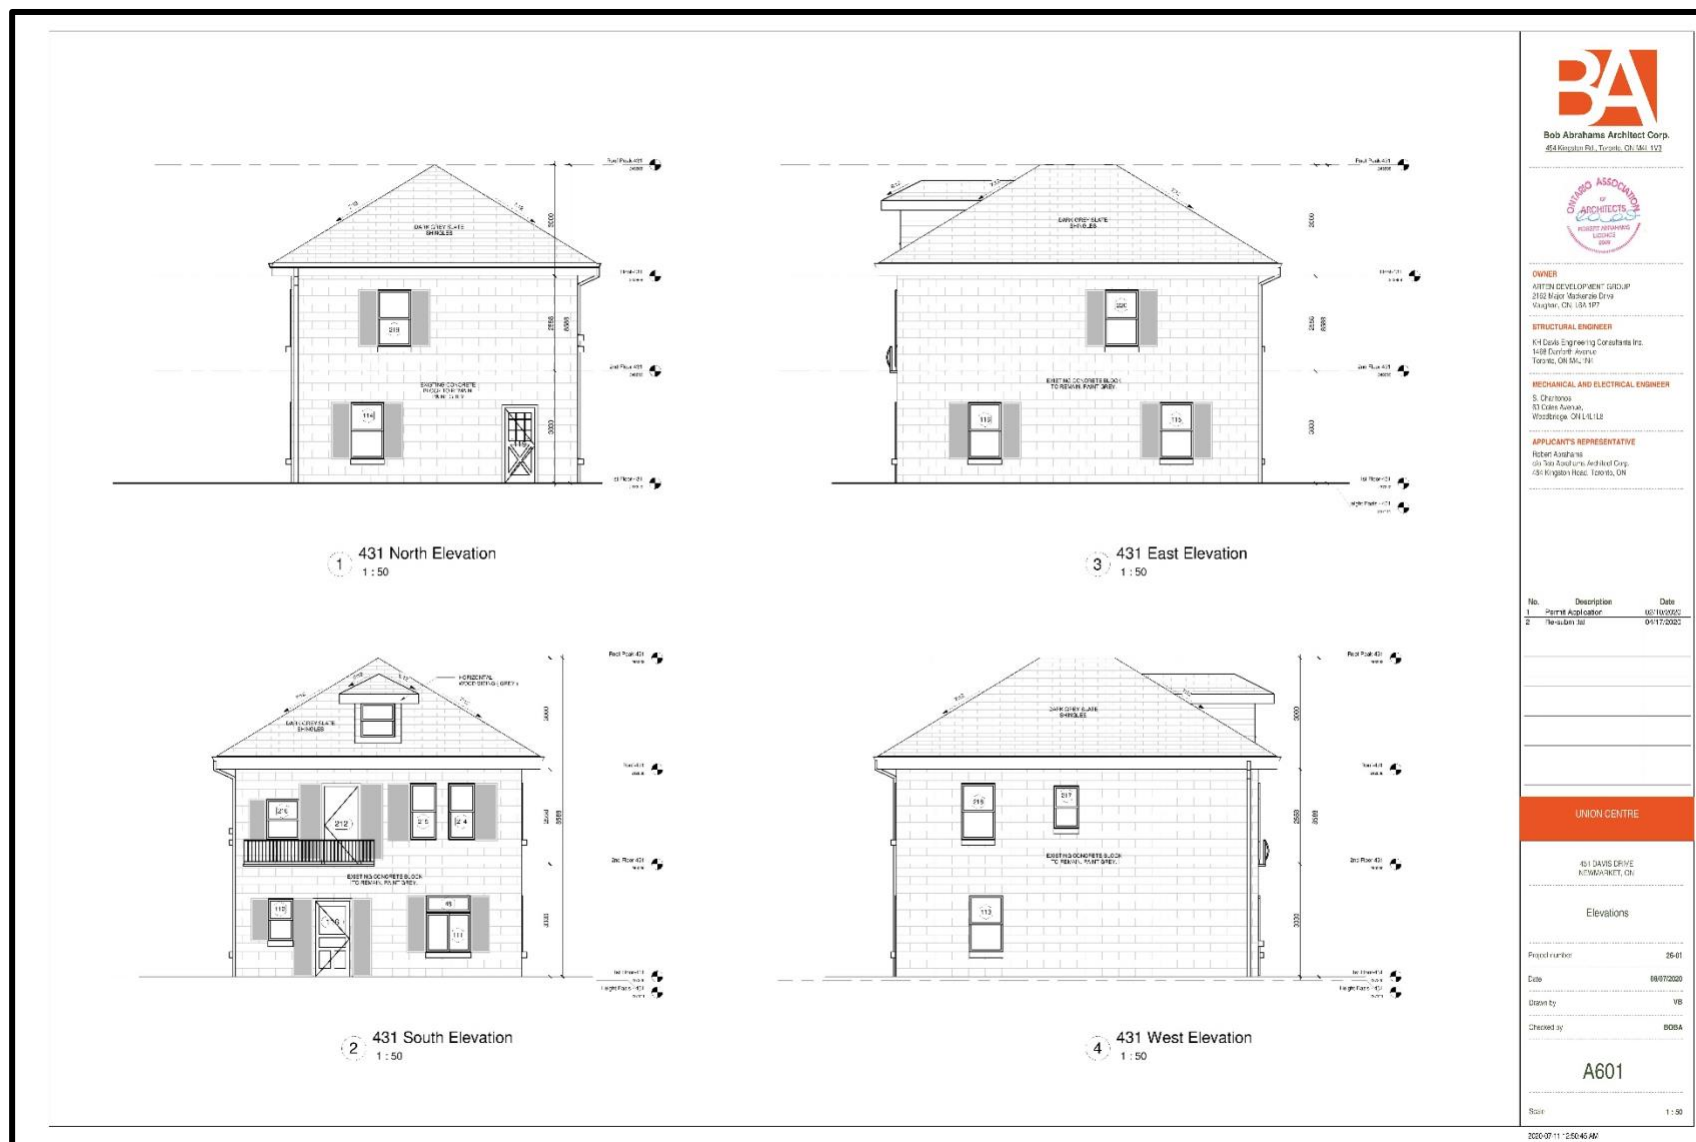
Elevations of Proposed Alterations for 431 Davis Drive
